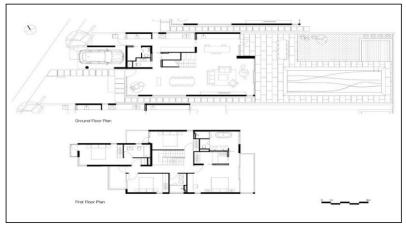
Ground and first floor plans of whitesands housing (SAR, 2011)
